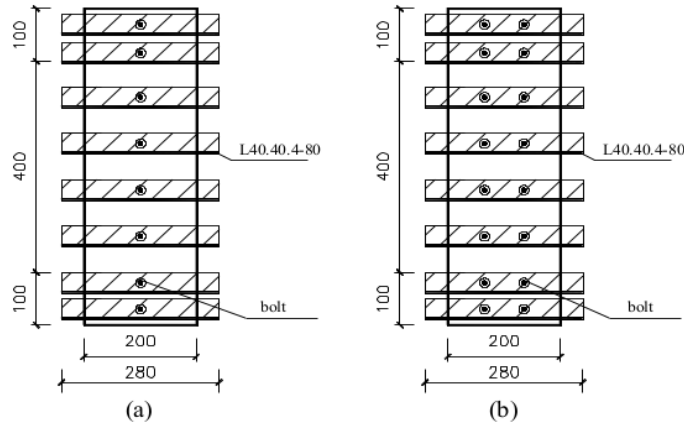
Elevation views of external confinement arrangements of specimens: (a) S04e; (b) S04f
